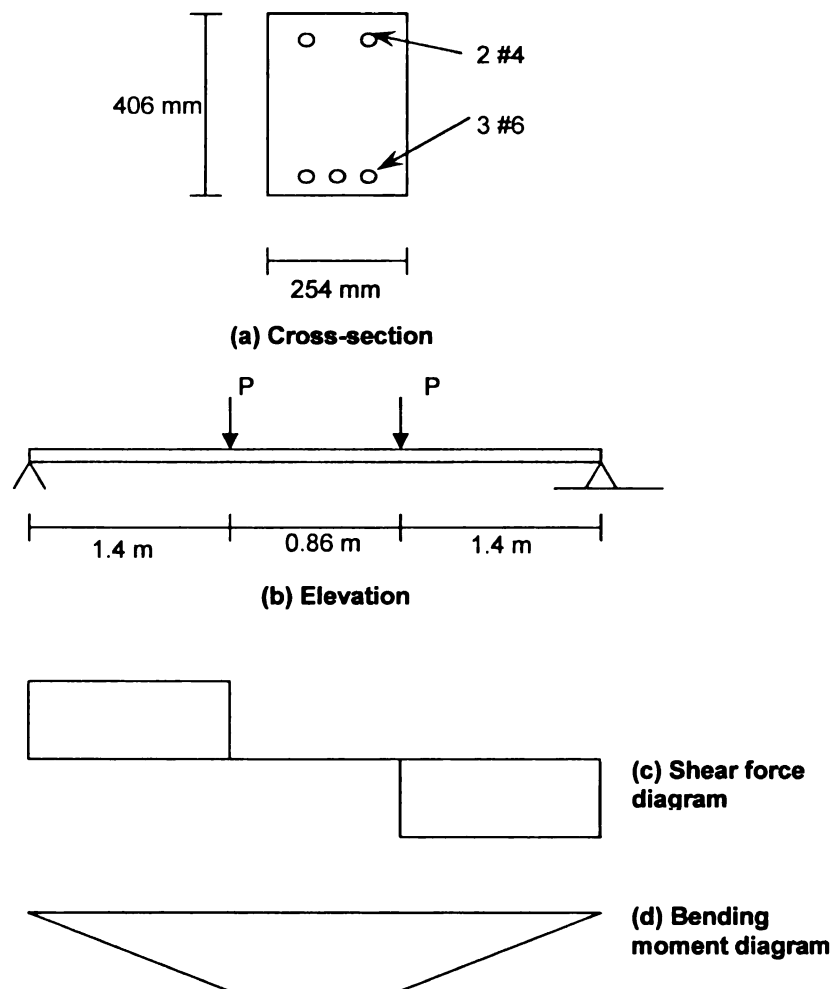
Cross-section, Elevation, Shear Force Diagram, and Bending Moment Diagram for Tested Beams
